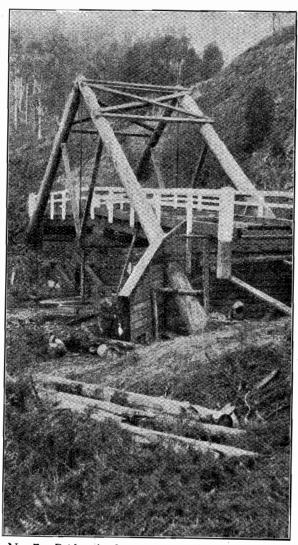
Bridge (under construction) over Merriman's Creek.
